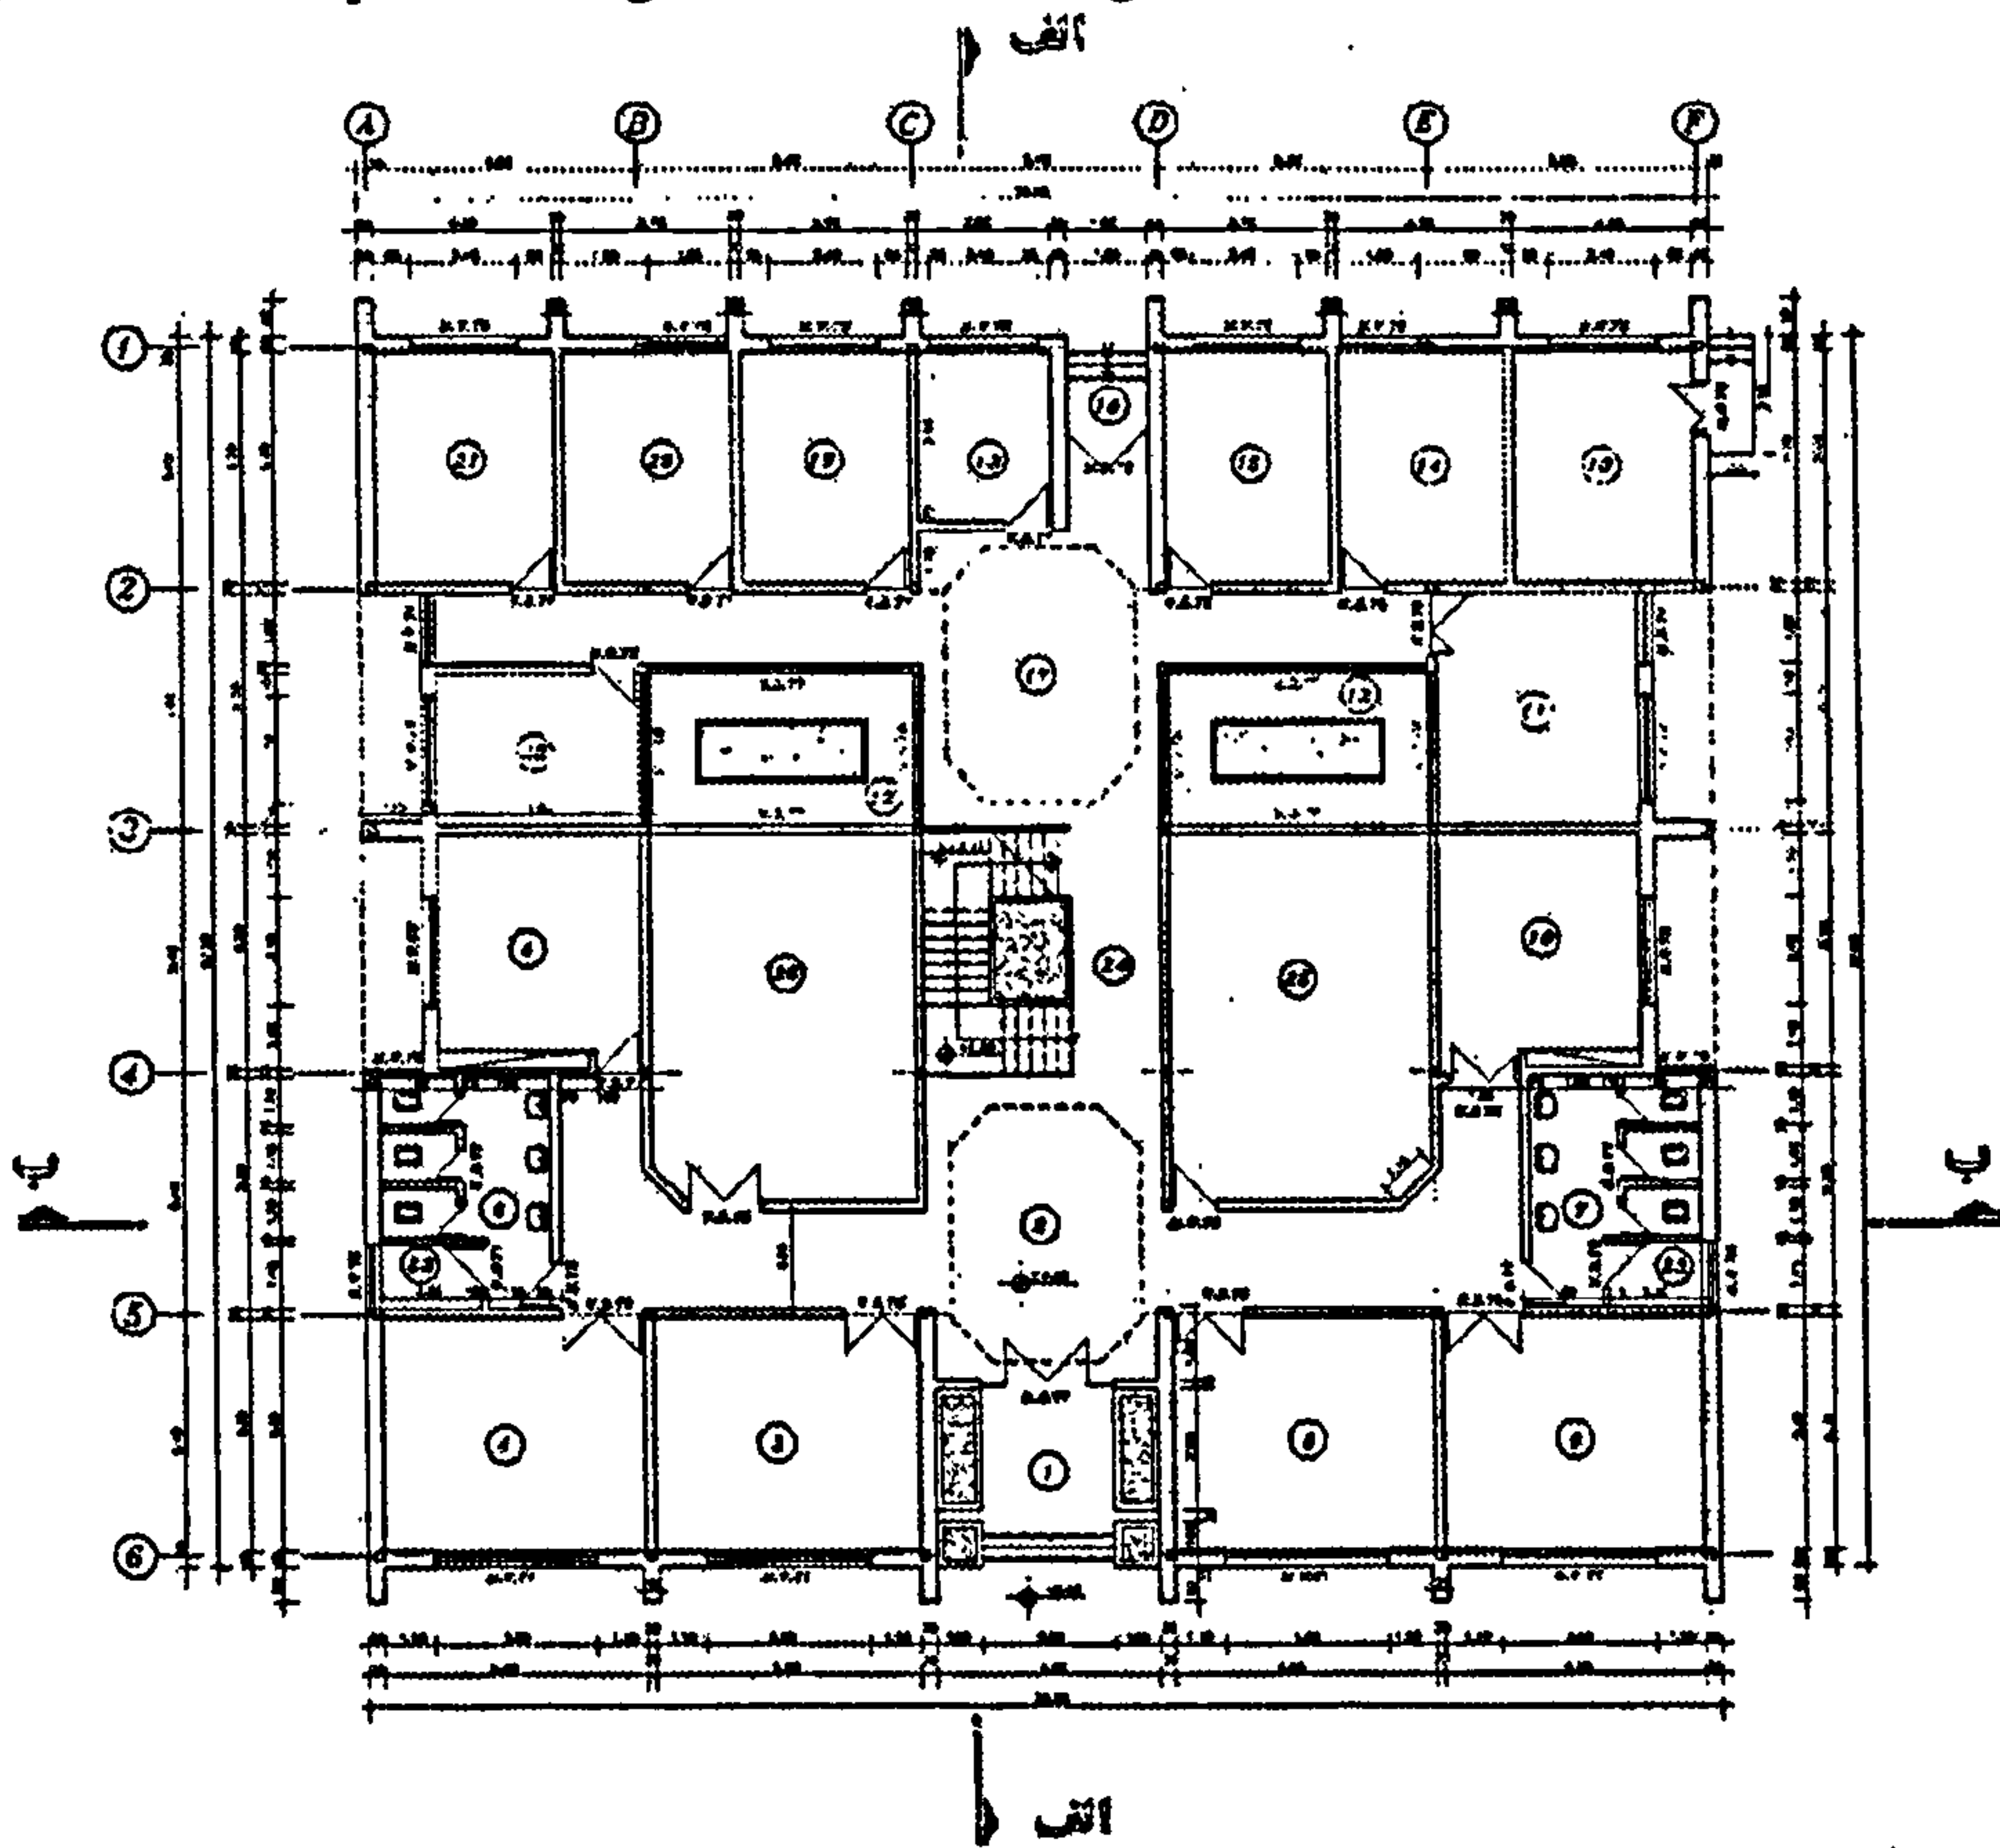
The plan of the first floor of a high school with 9 classrooms (Number 3)
